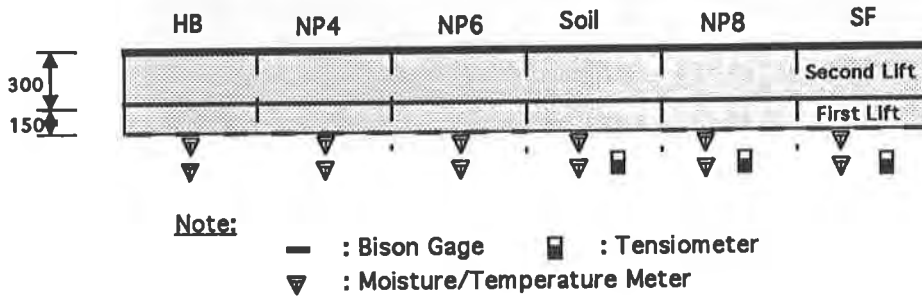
Cross Section Showing Instrumentation Placement (dimensions in mm).
